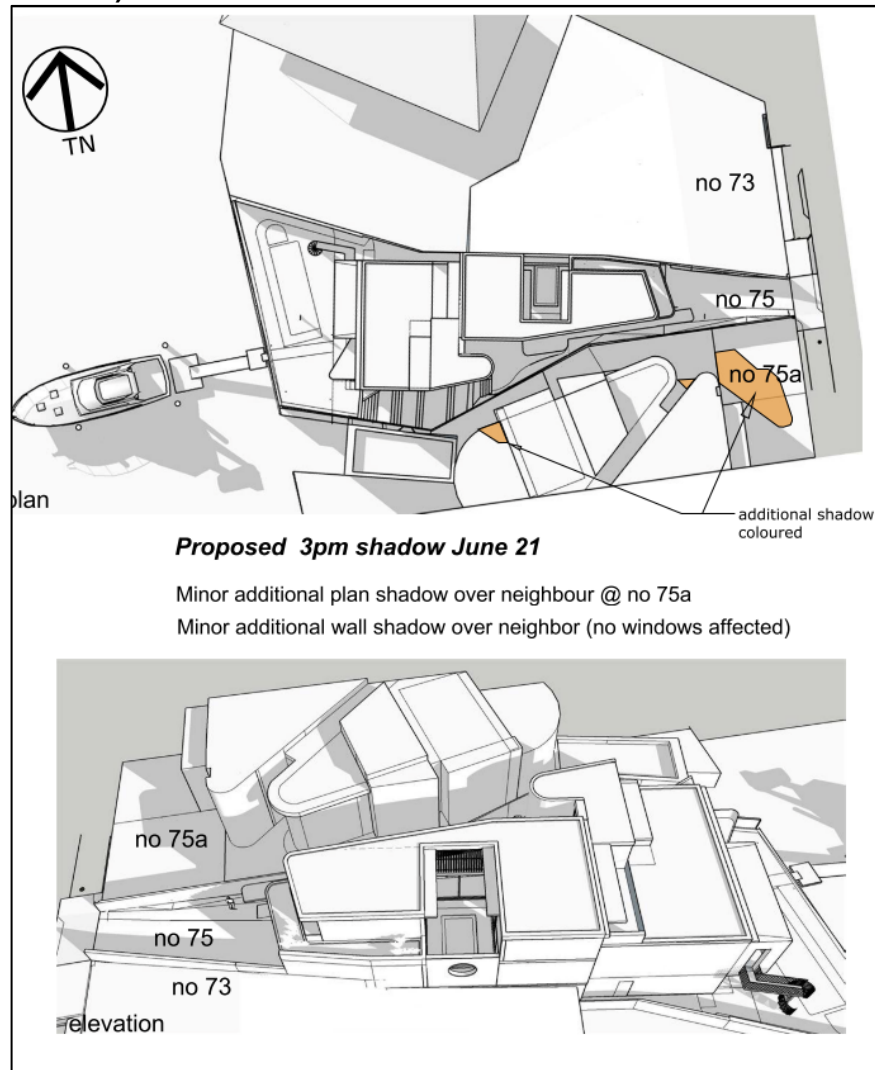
Proposed shadow cast at 3pm onto neighbouring property at 75A Wharf Road
